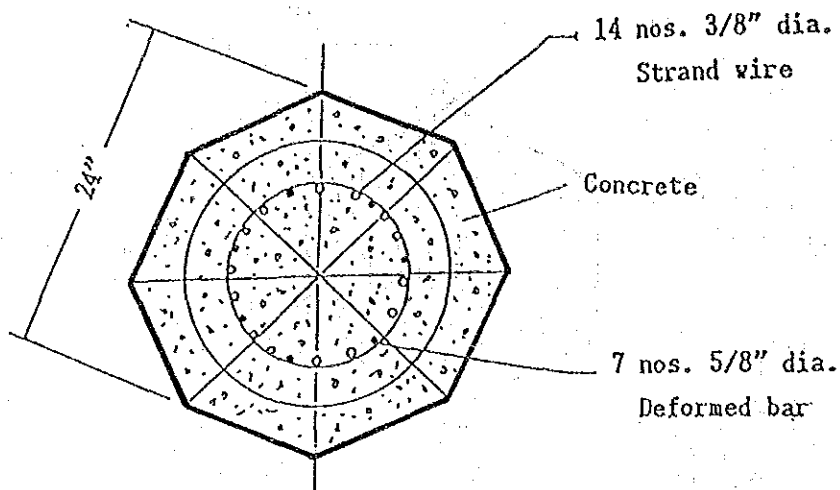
Typical Cross-Section of PS octagonal pile
